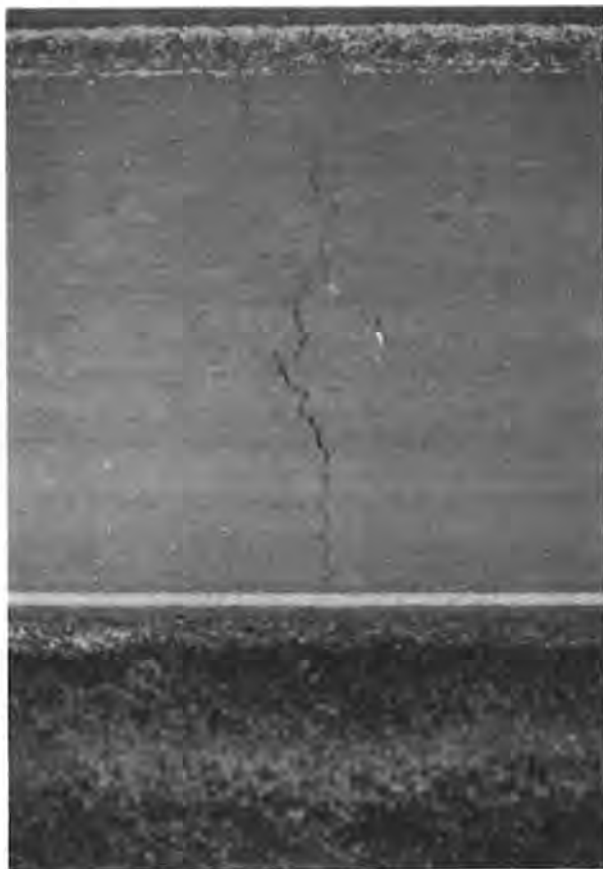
Typical transverse crack found at 30- to 40-ft intervals throughout the project.
